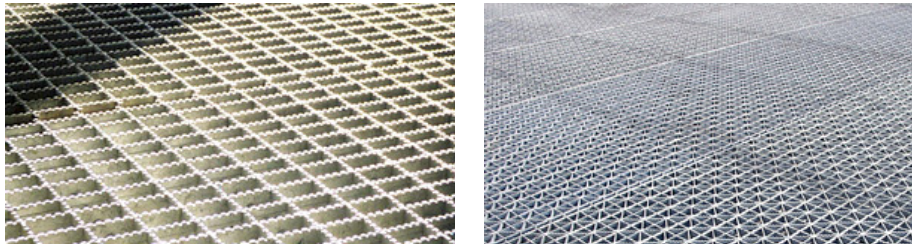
Open Rectangular and Diagonal Steel Grating for Bridge Decks
